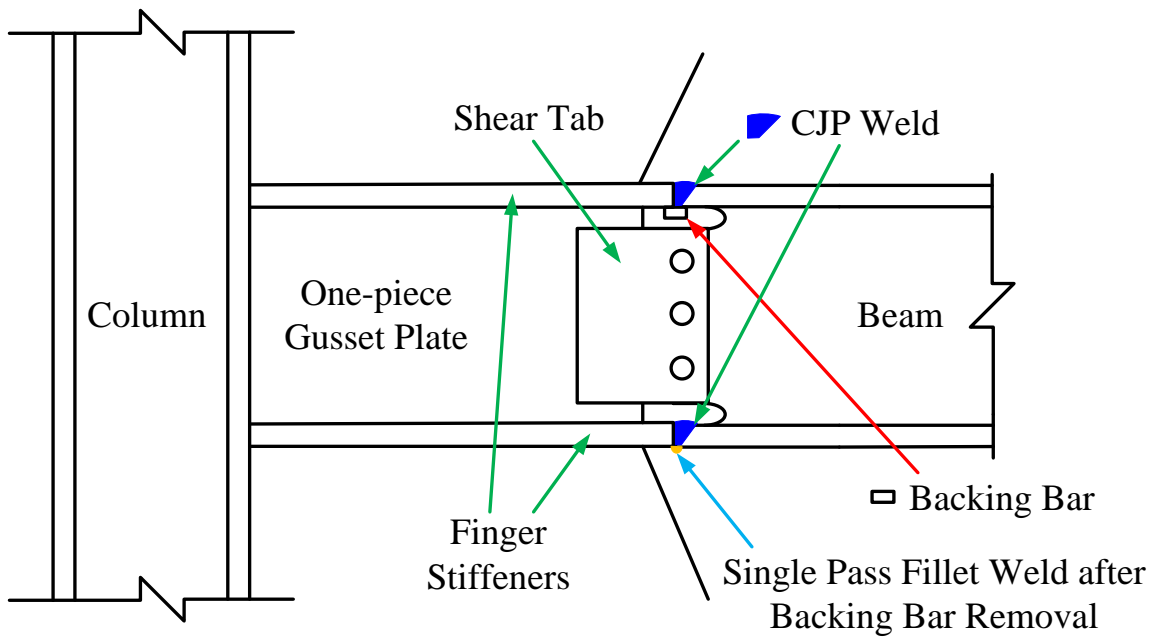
(b) Specimen TCBF-B-2 lower beam-to-gusset plate connection weld details
